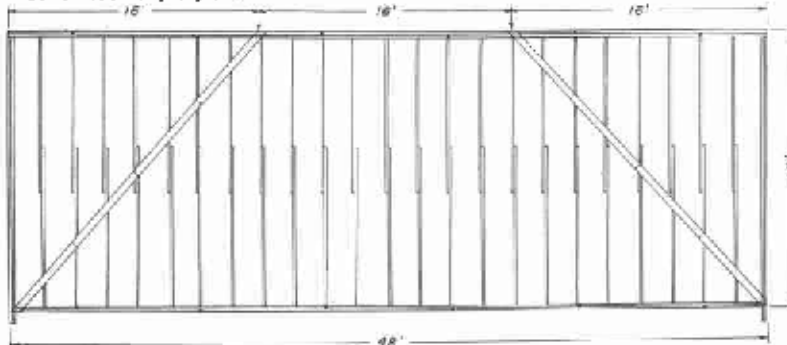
Construction details of 18- by 48-foot hayloft floor panels. Test No. 1: Longitudinal 1- by 6-inch sheathing spaced  $1/8$  inch between boards and  $3/6$  inch between boards and joists and nailed at each joist crossing with two eightpenny nails. Test No. 2: Same as test No. 1 with 1- by 6-inch boards nailed to the underside of the joists, as shown, with two eightpenny nails at each joist crossing. Test No. 3: Diagonal 1- by 6-inch boards spaced  $8-3/4$  inches between boards and nailed to joists with two eightpenny nails. Longitudinal 1- by 6-inch sheathing laid over diagonal sheathing and nailed with two eightpenny nails at each board crossing. Test No. 4: Diagonal 2- by 6-inch continuous bracing nailed at each joist crossing with two sixteenpenny nails.
